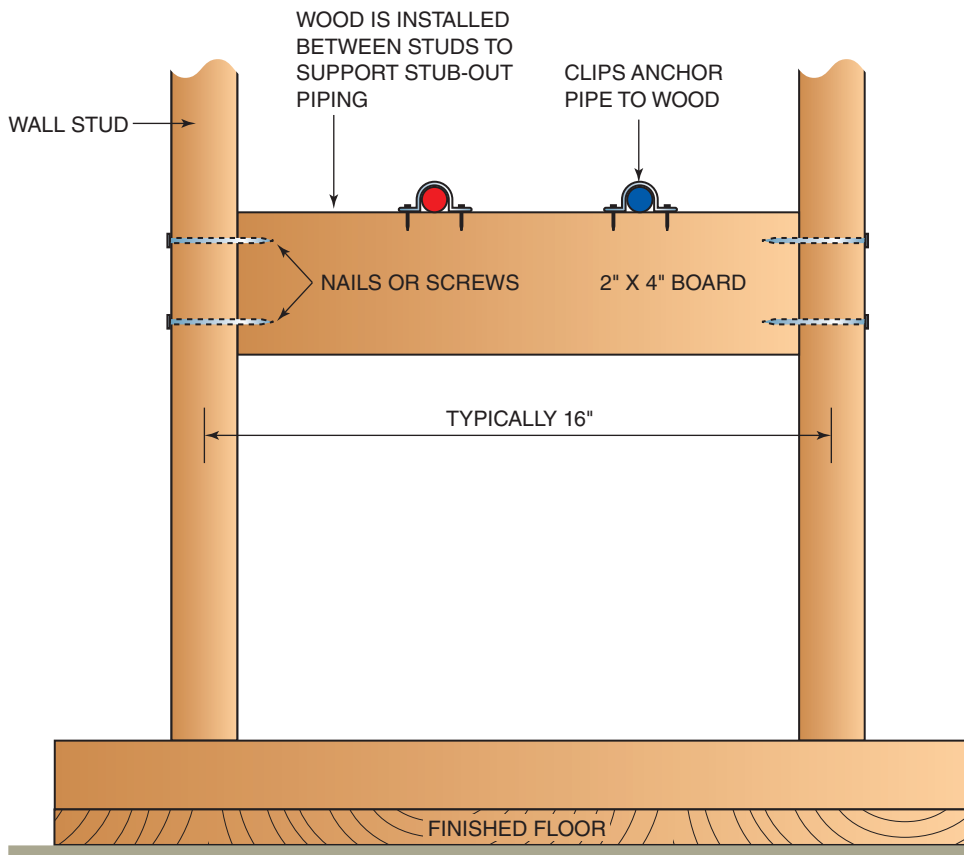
A 2"×4" wood board can be used to support stub-out piping serving a fixture instead of a manufactured stub-out bracket.
